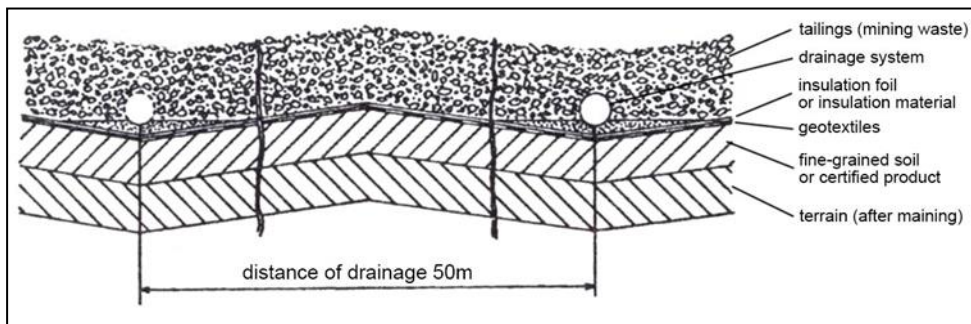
Scheme of an open drainage system in mining (contaminated water)
